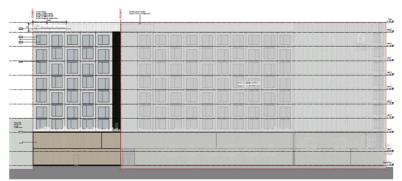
Proposed Southern Elevation (showing 2-8 Sarah Street hatched in grey)
